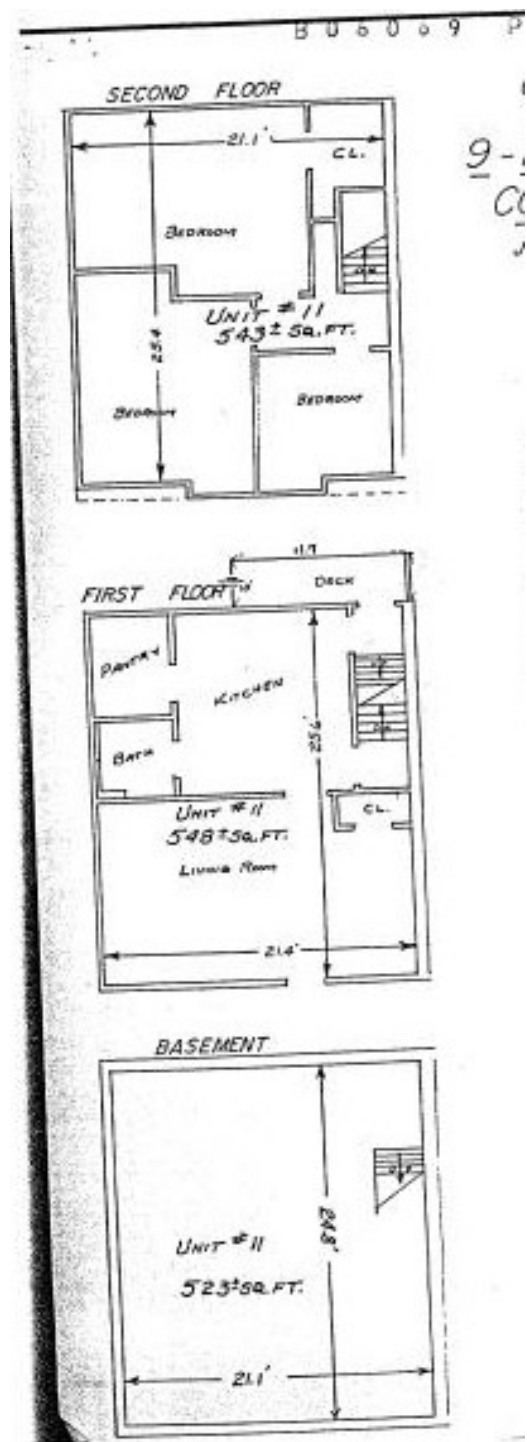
Detail of Floor Plan for #9 -11 Alder Street, c.1992 (MCRD: 06069/0115,1992)
